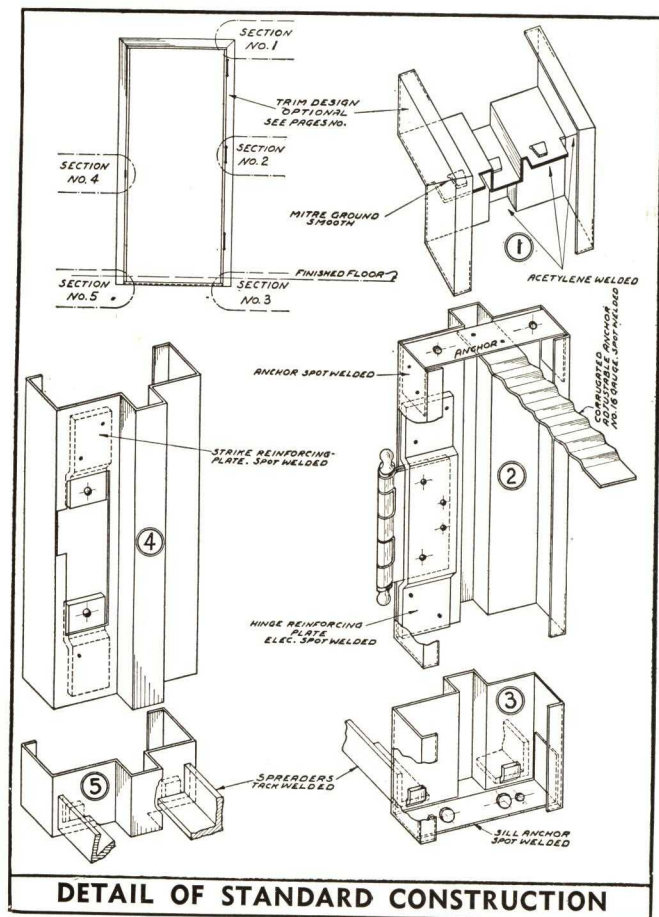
The entire inside through the jamb and mitre is continuously acetylene-welded. This insures that there will be no chance of breaking of head from jamb. Additional rigidity is obtained by the three tongues which prevent the head member breaking away from the jamb.
